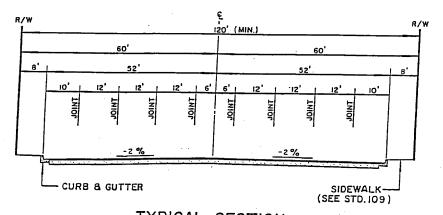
(1 of 5): EAST VALLEY SPECIFIC PLAN ROADWAY CROSS-SECTION
